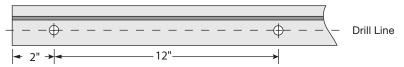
Recommended countersink hole spacing in iamb extrusion. DO NOT DRILL CLADDING.
